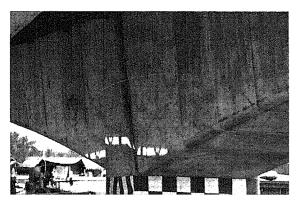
Cracks in Rama 5 (Web of main girder)
